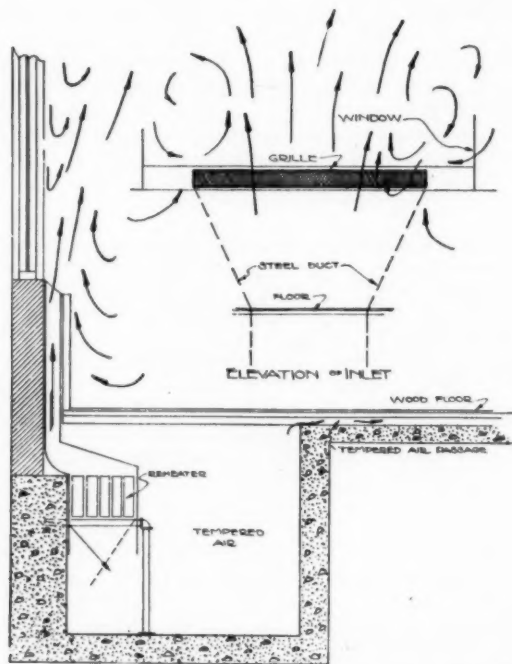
PLAN, ELEVATION AND SECTION OF AN INLET GRILLE
